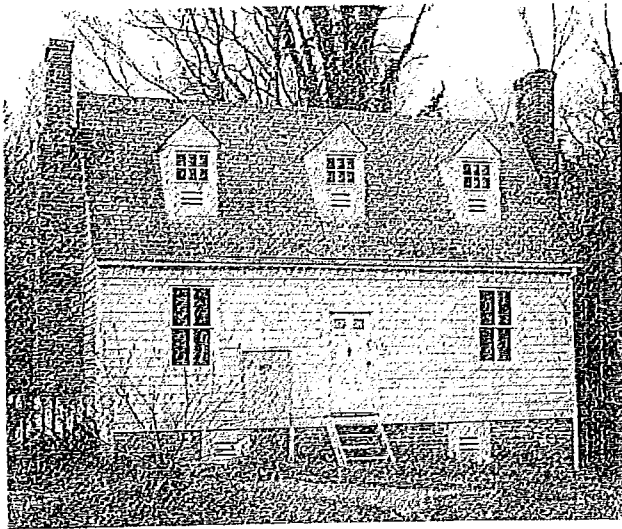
Regrading around the Booker Tenement at Colonial Williamsburg has protected the masonry foundation wall from excessive damp. This building has been successfully mothballed for over 10 years. Note the attic and basement vents, the temporary stairs, and the informative sign interpreting the history of this building.
